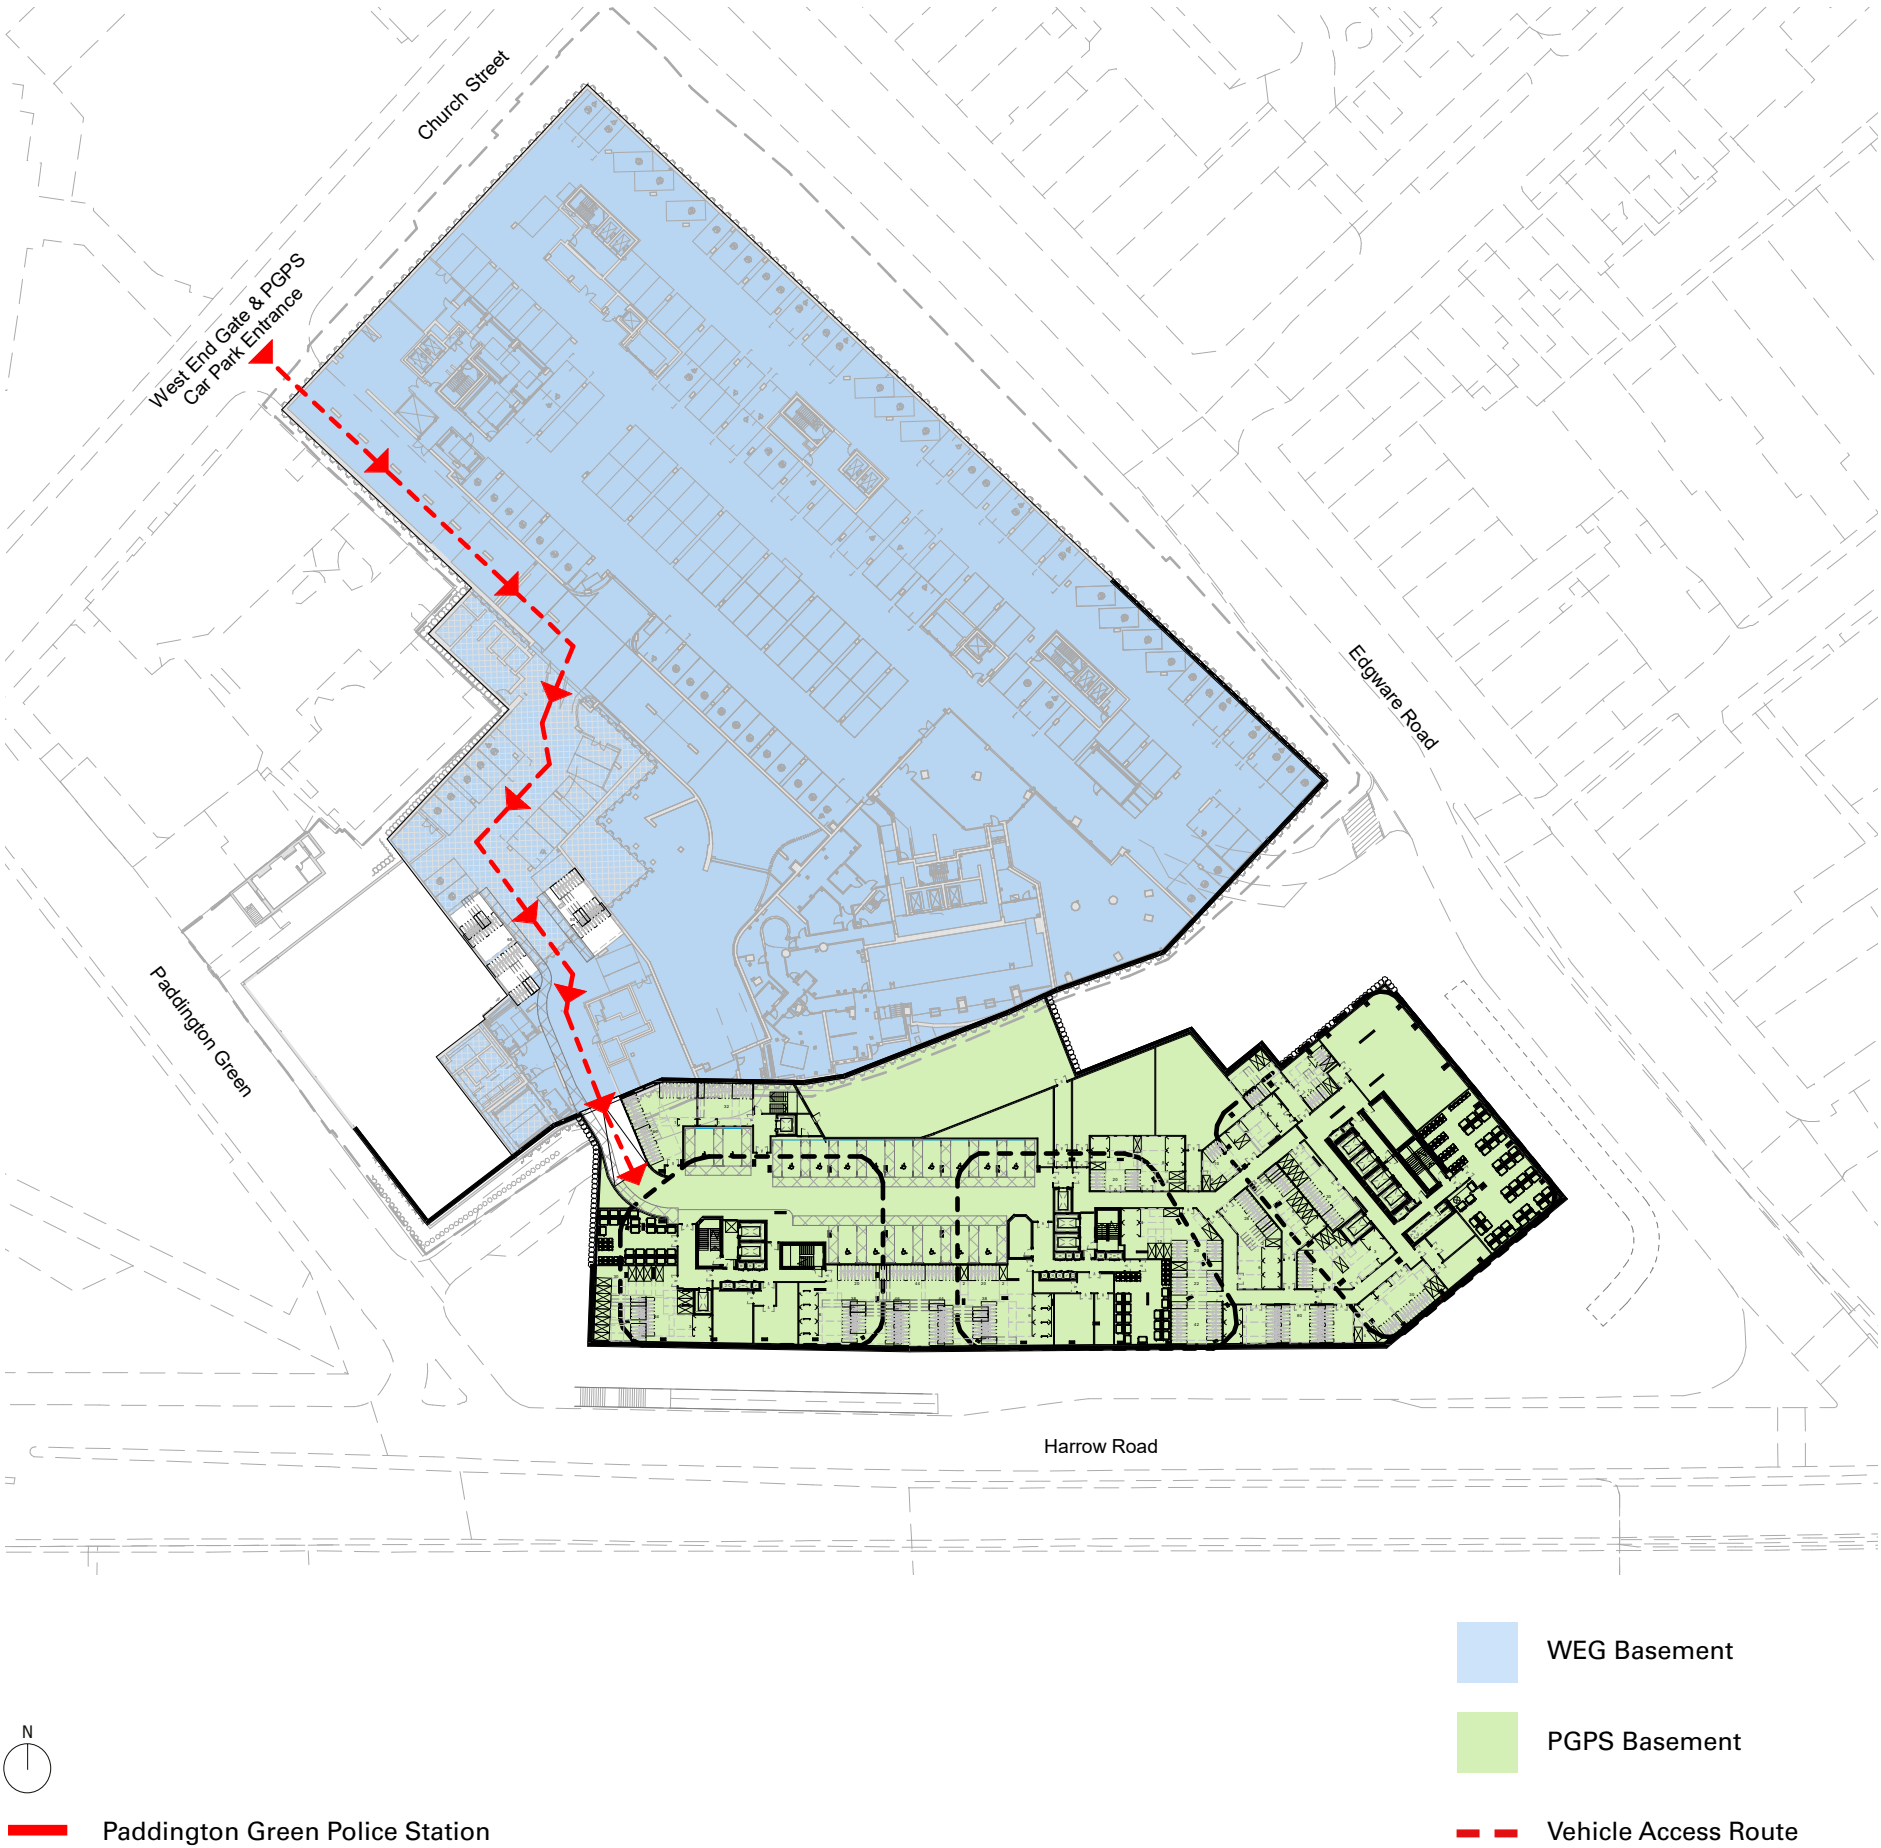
WEG, 14-17 Paddington Green and PGPS Basement Plan - Servicing Strategy
